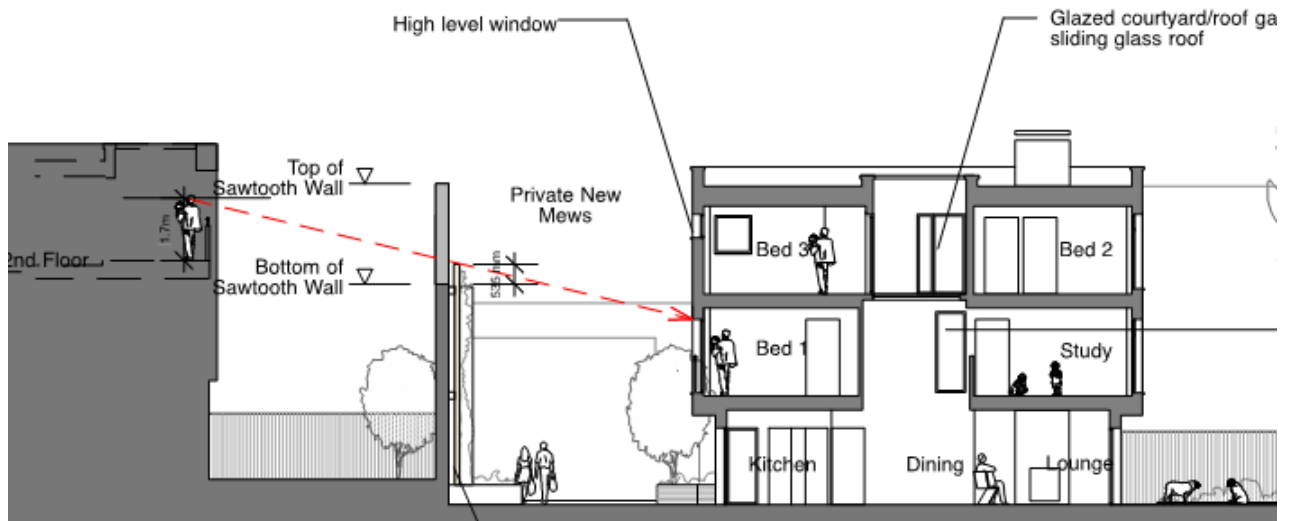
Proposed Section drawing showing the retained wall and additional timber screen between the existing and proposed houses, and potential views from the balconies at 6-22 Melody Lane.
